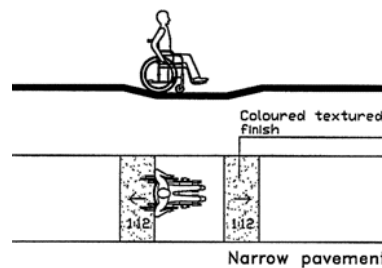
The pavement be lowered to the road level to obtain the required transition between the pavement and the road surface.
